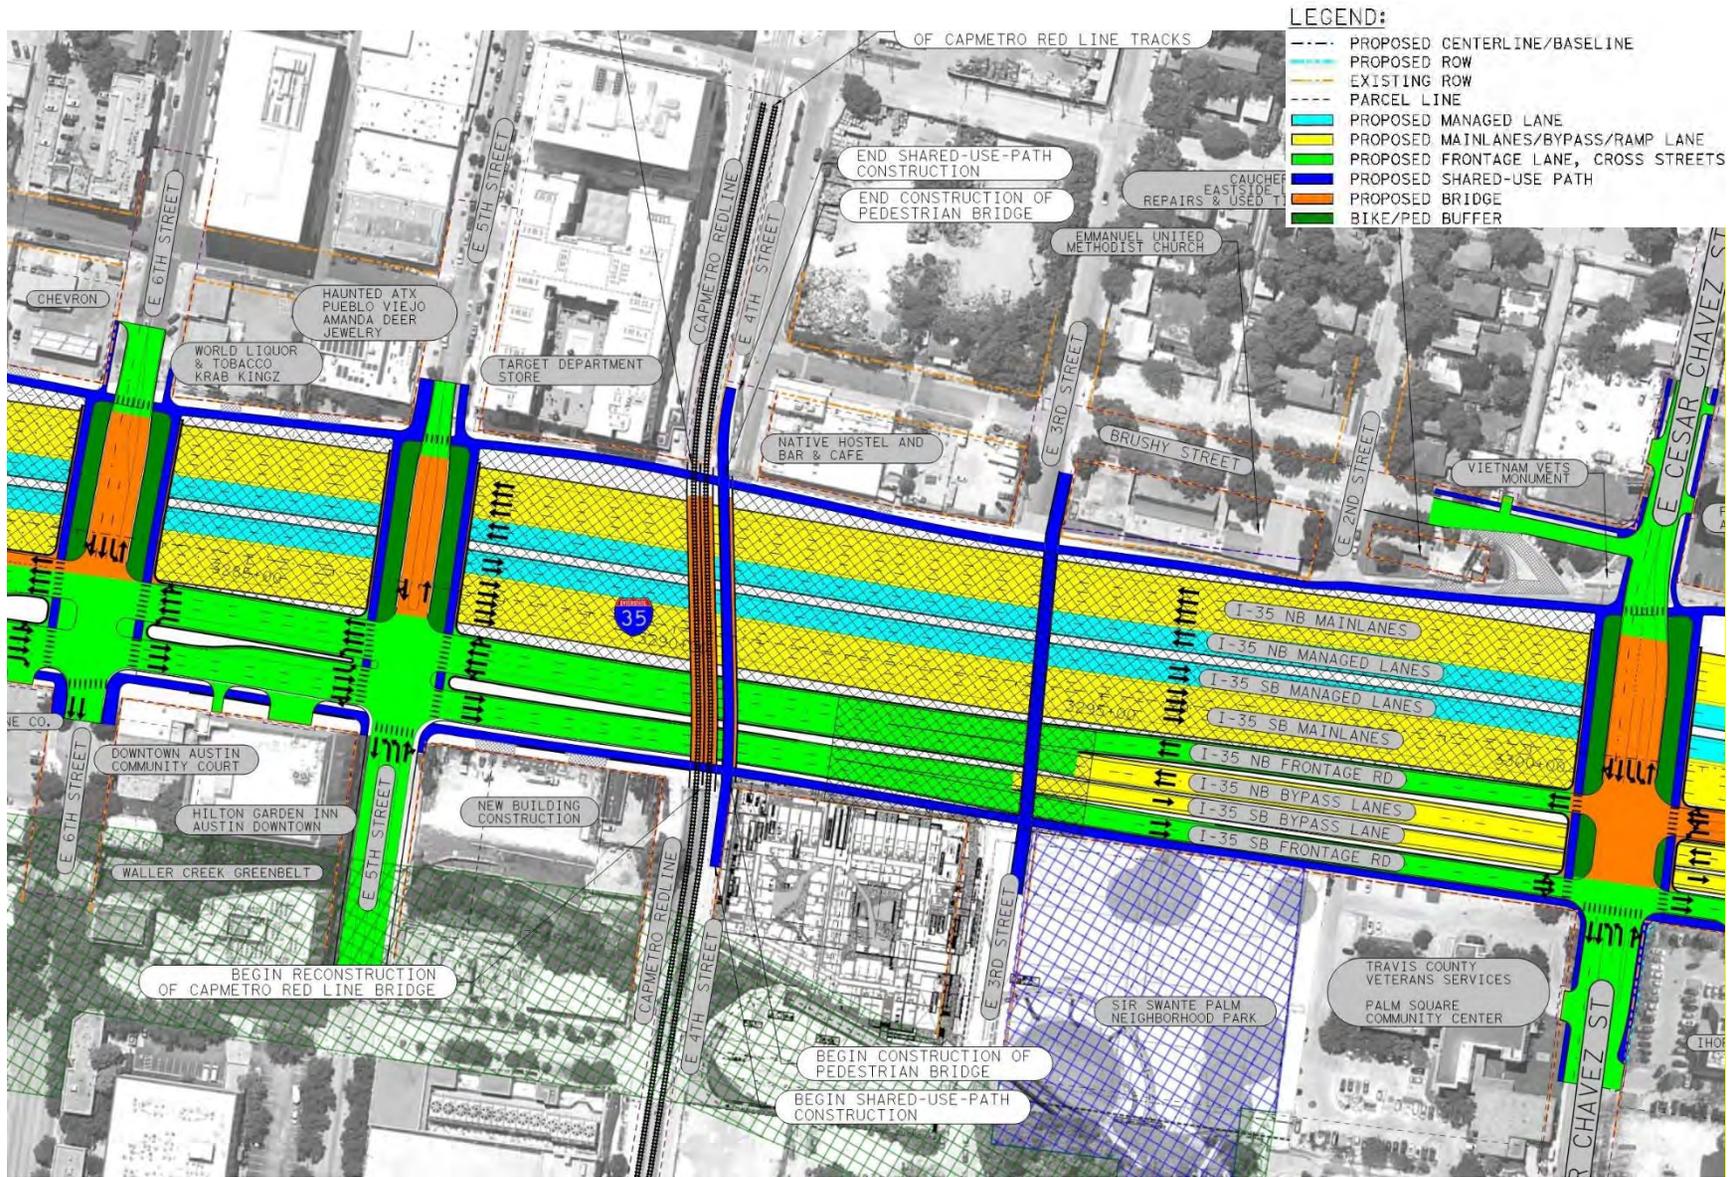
Cross-section of Alternative 2 project schematic showing proposed configuration in the Walker Brothers Warehouse vicinity.
